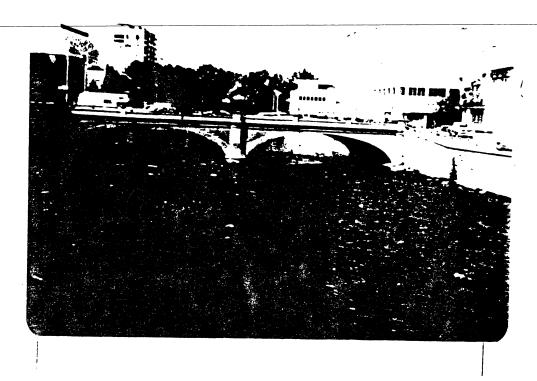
ELEVATION VIEW OF VIRGINIA ST. BRIDGE
